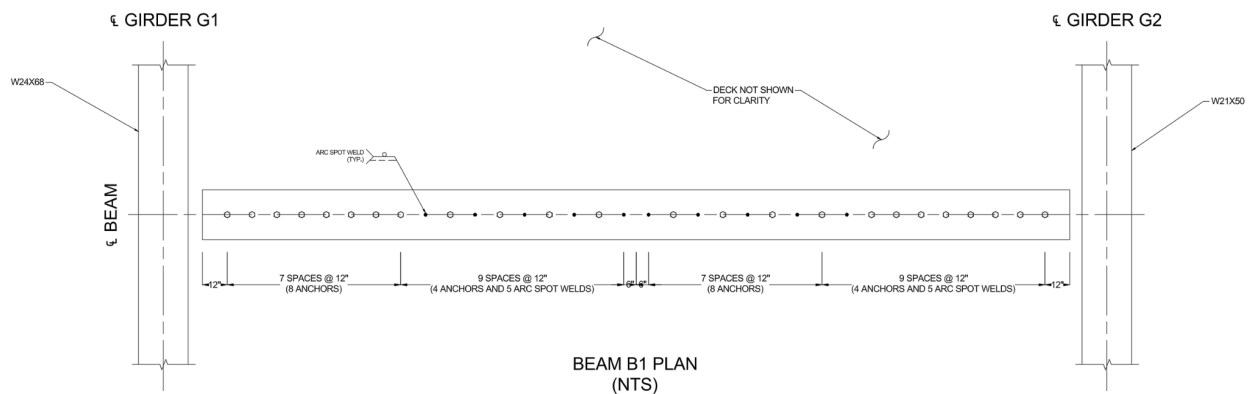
Beam B1 Steel Headed Stud Anchor Layout
